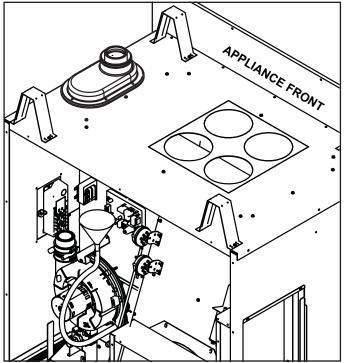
Upper Inducer Housing Tube Connected to Field-Supplied Funnel
